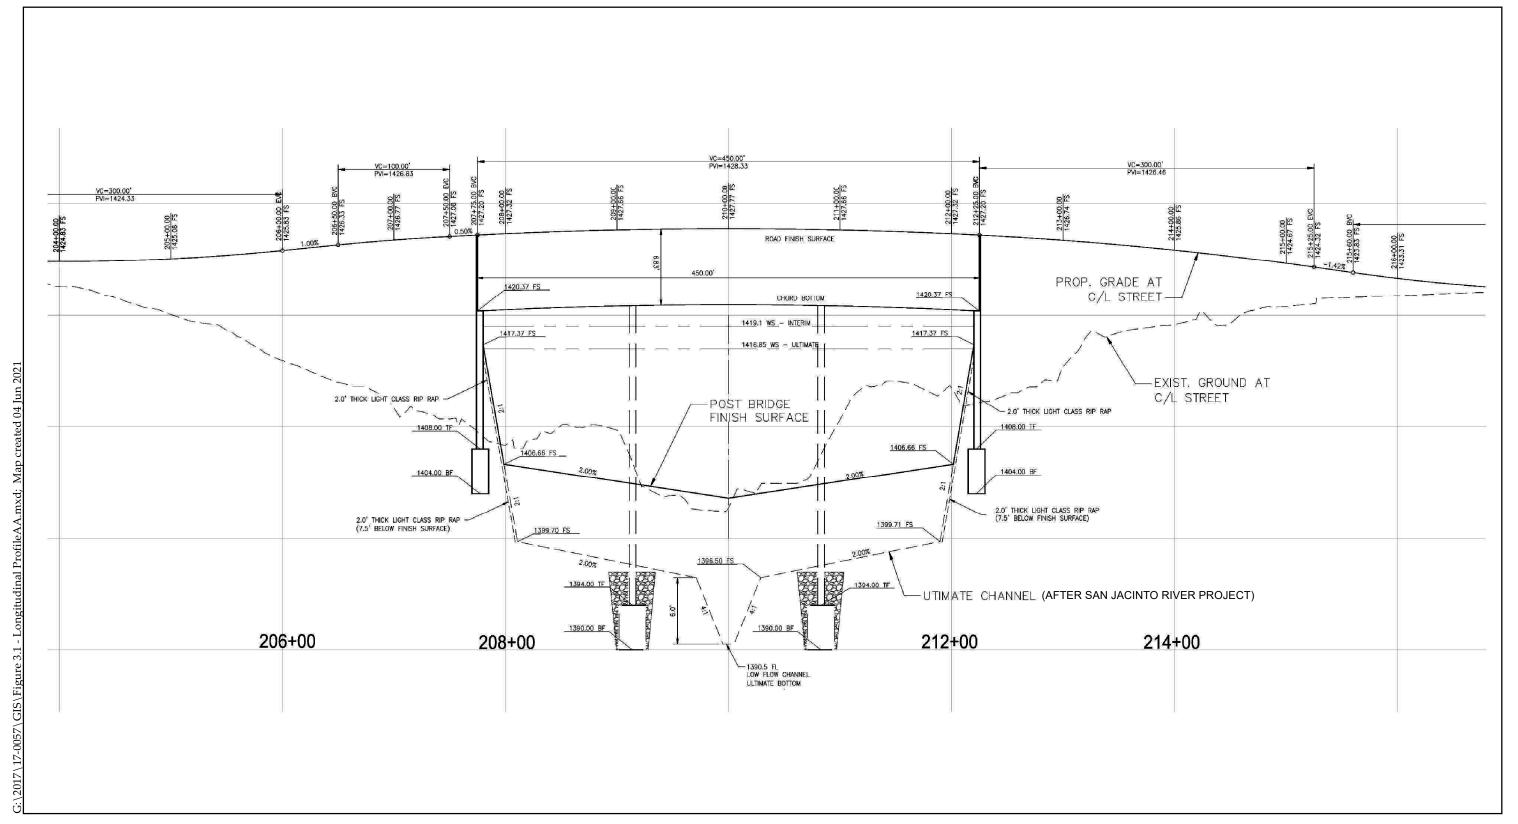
Bridge Section View Ethanac Road Bridge at San Jacinto River
